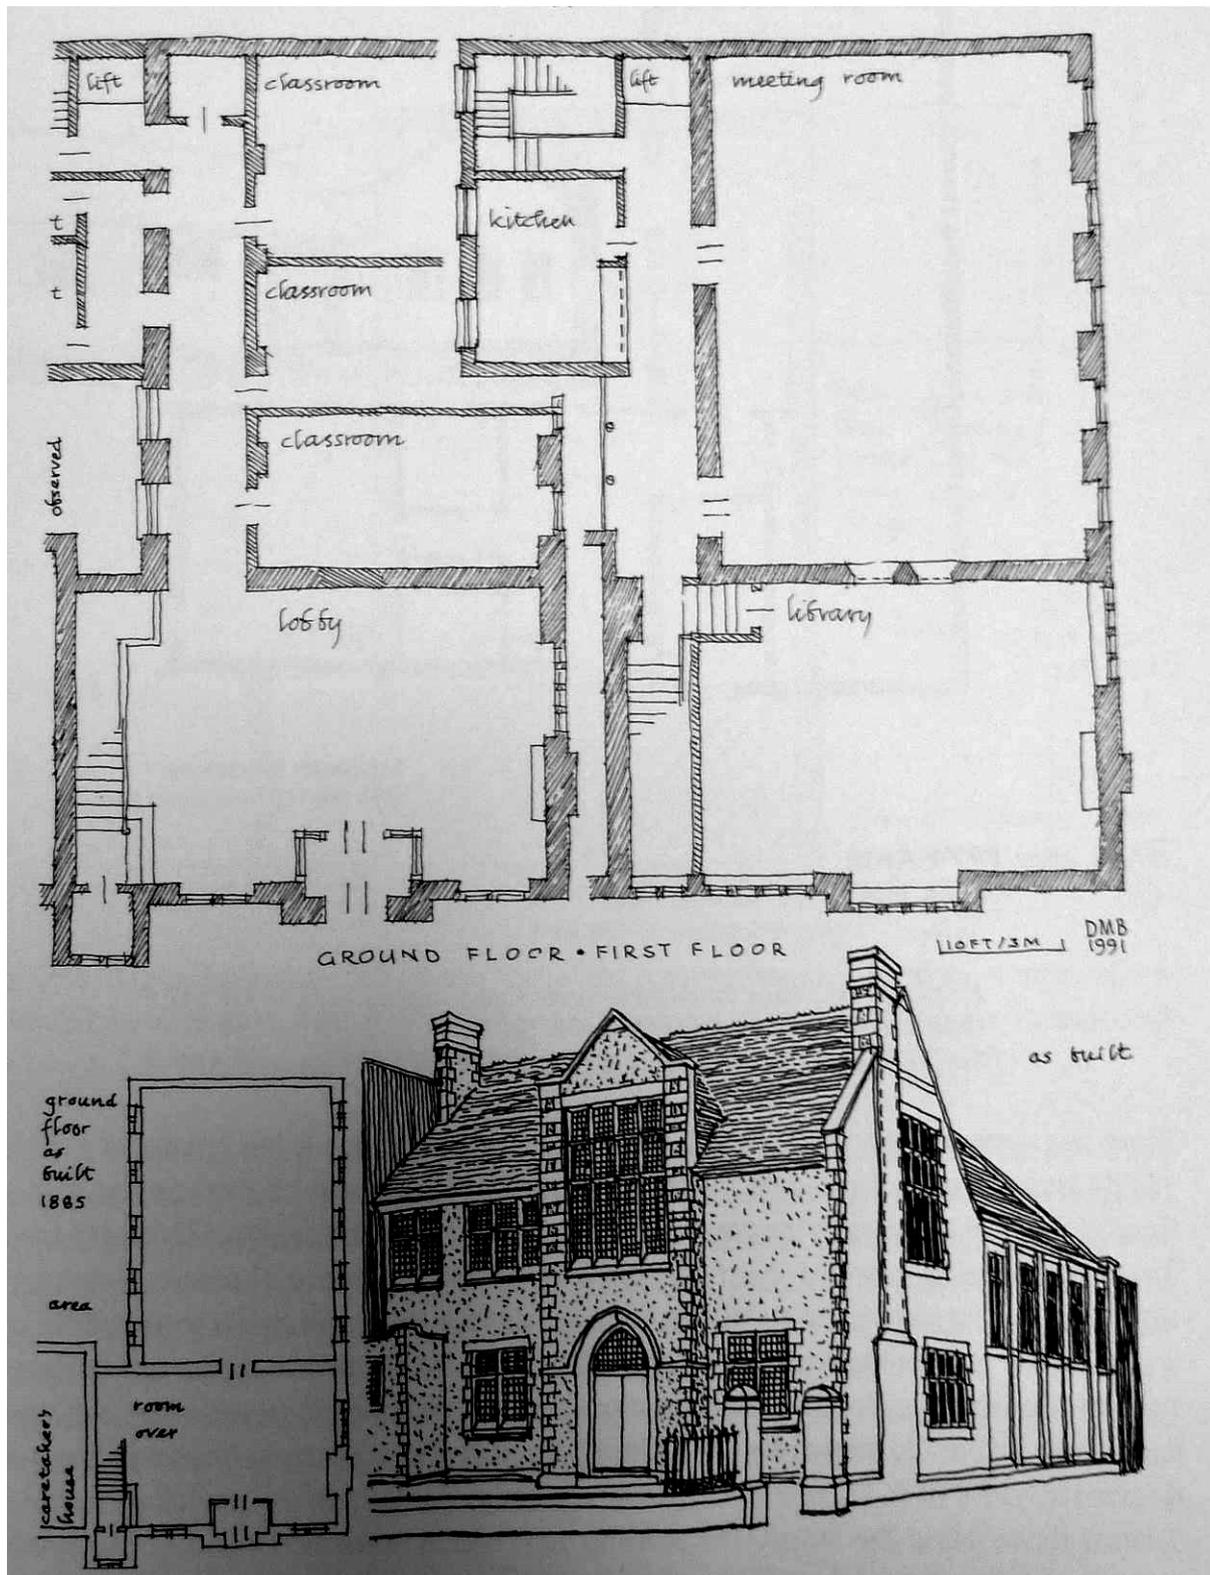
Plans and elevations, from Butler, Vol.2, 1999, p.527
